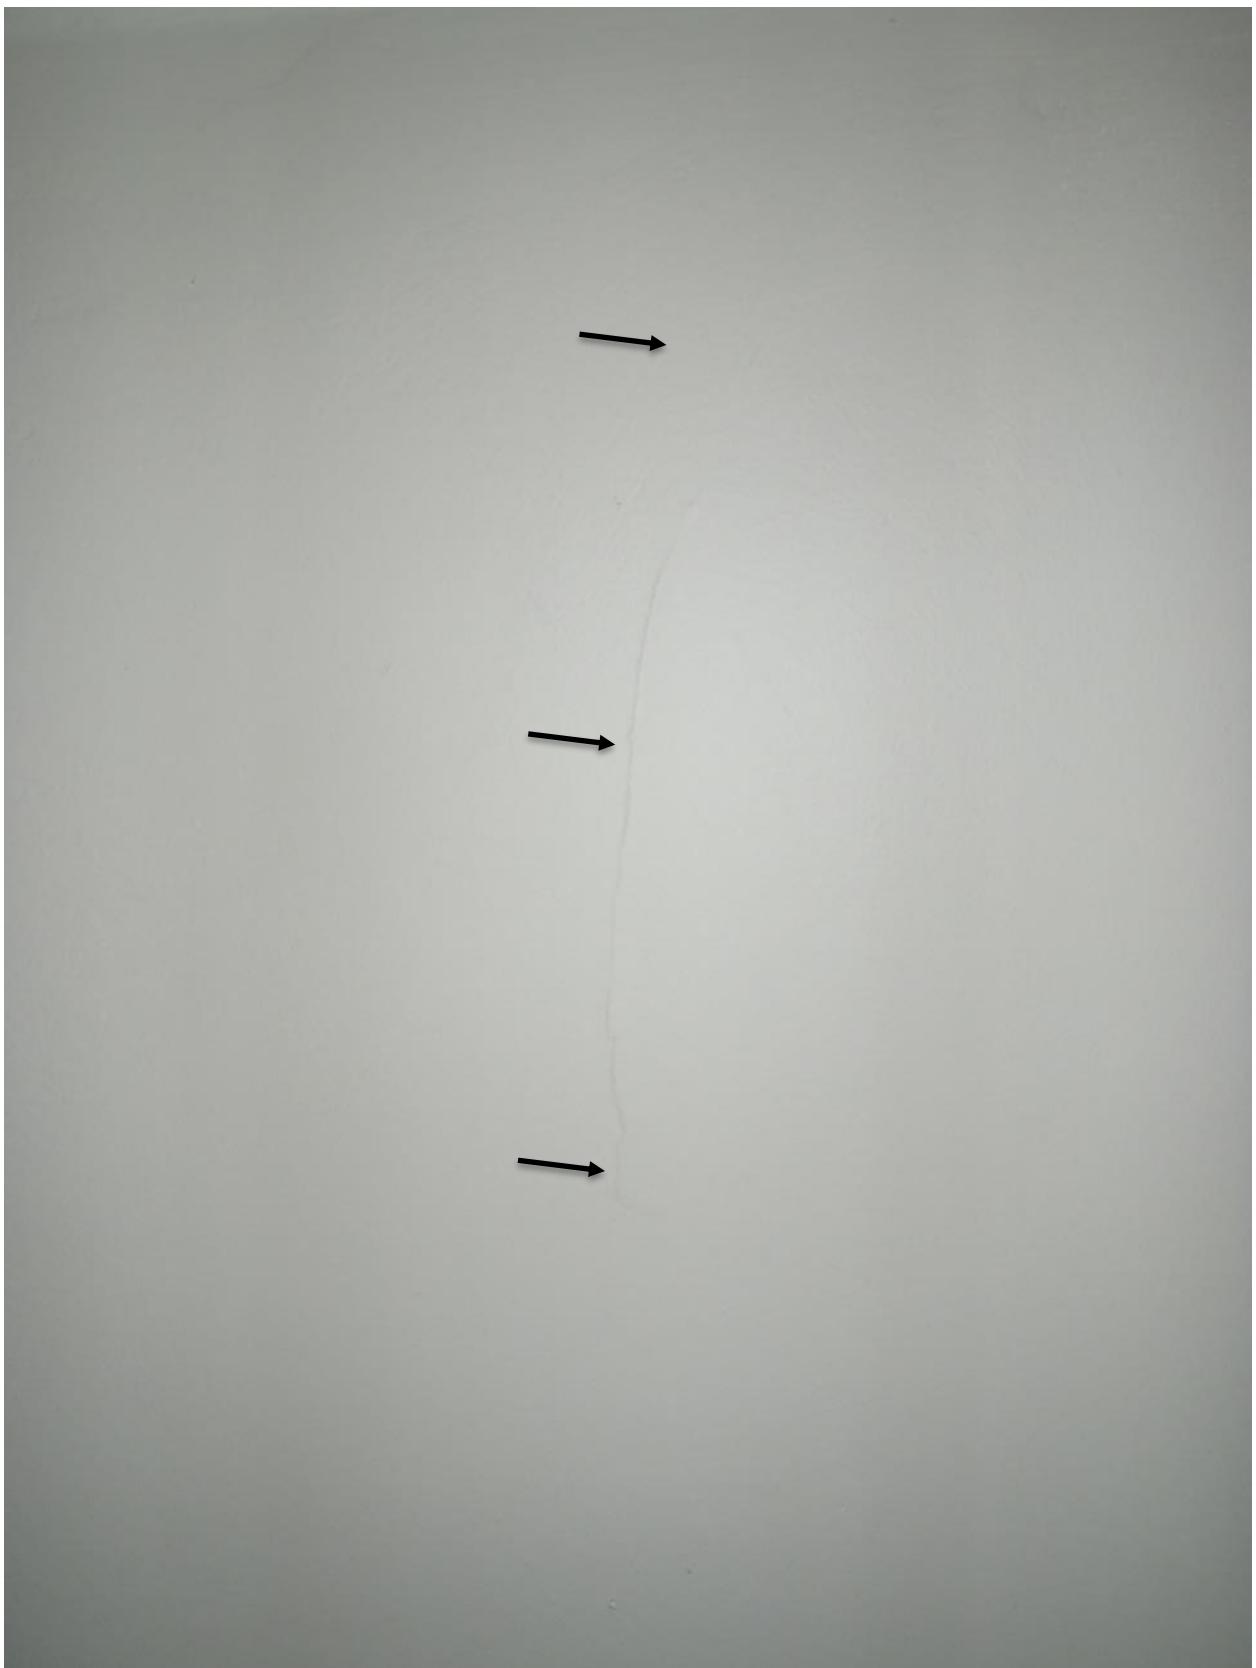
shows separation cracking at the square set wall and ceiling junctions adjacent to the western skylight in the attic.
